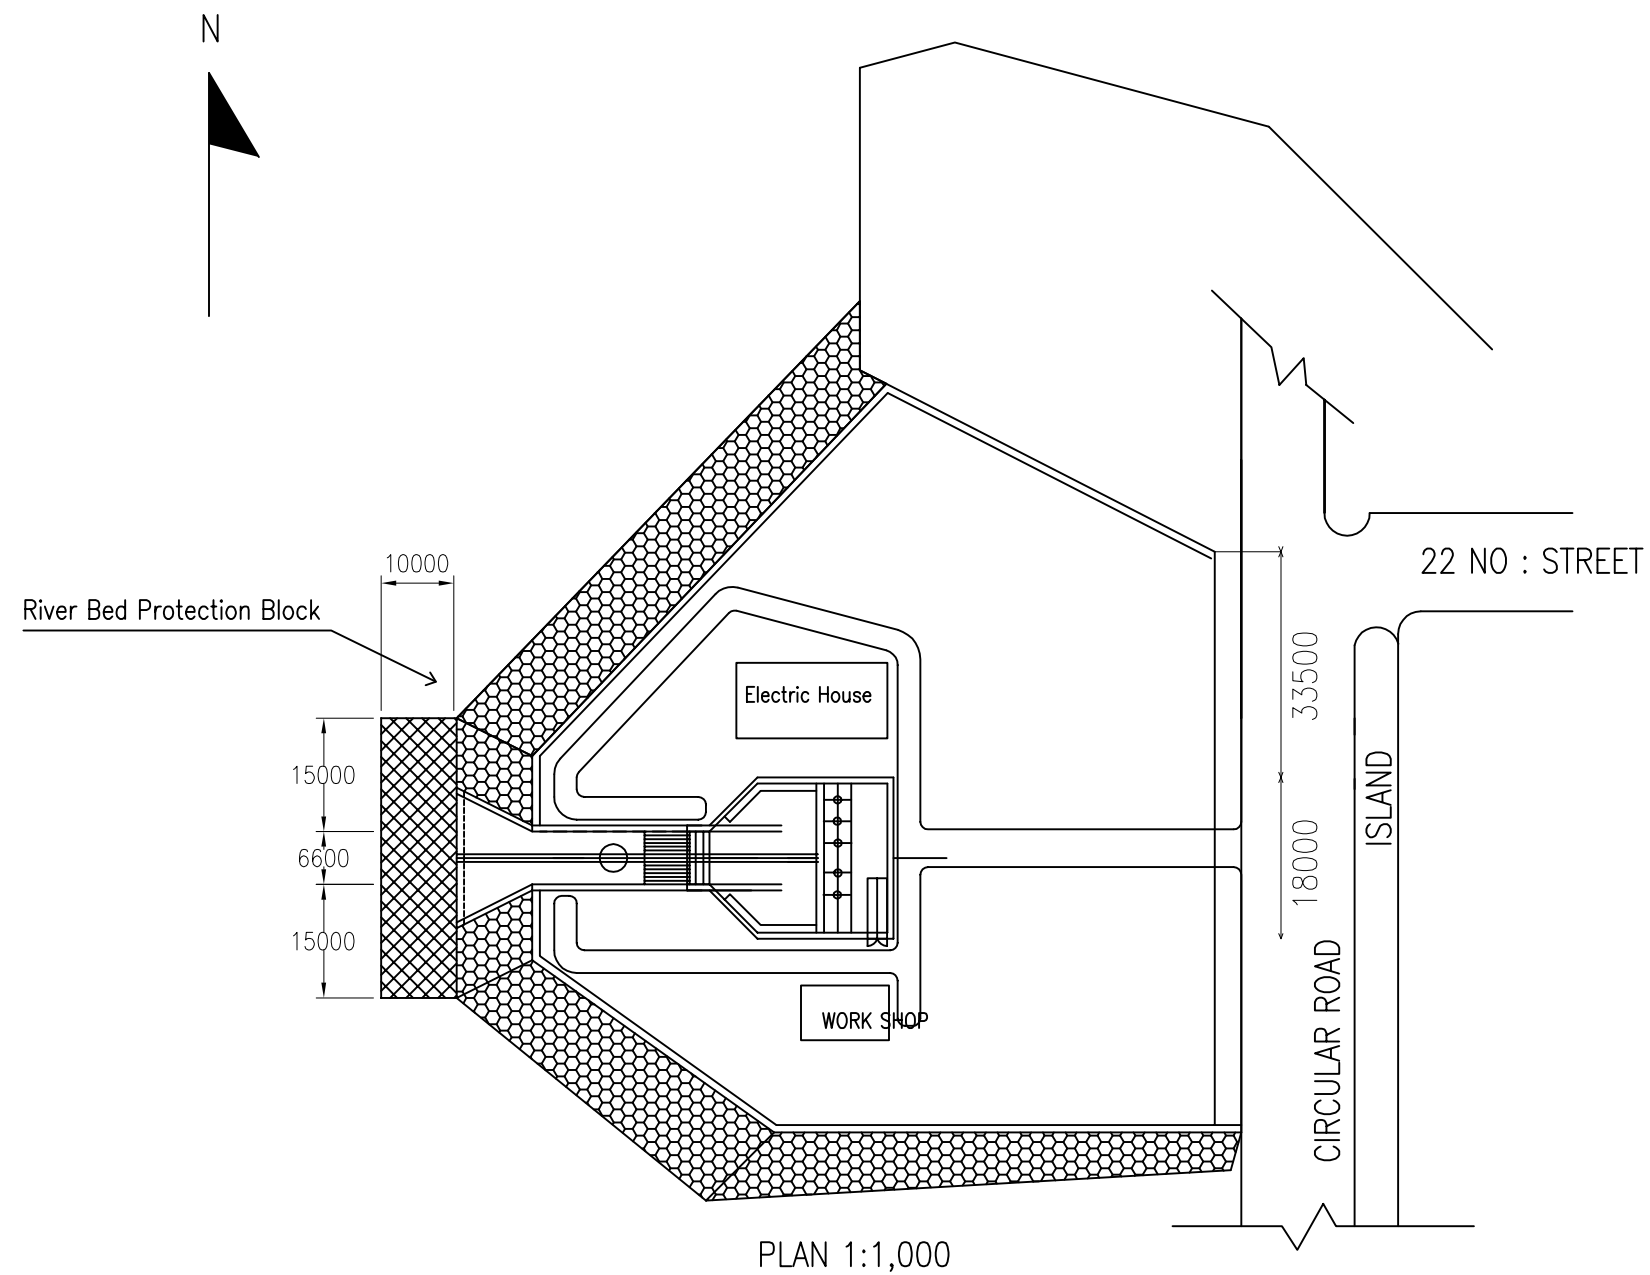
Proposed Raw Water Conveyance Plan
